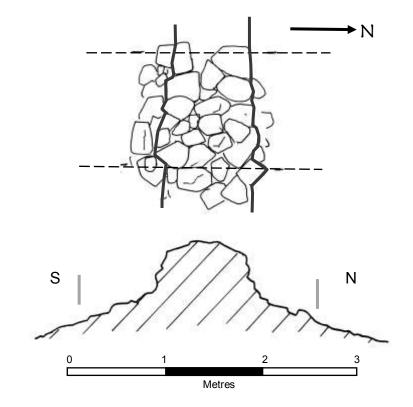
Slot A in Area 1 (6m from west boundary wall). Plan above with outline around remaining dry-stone wall and profile below.
